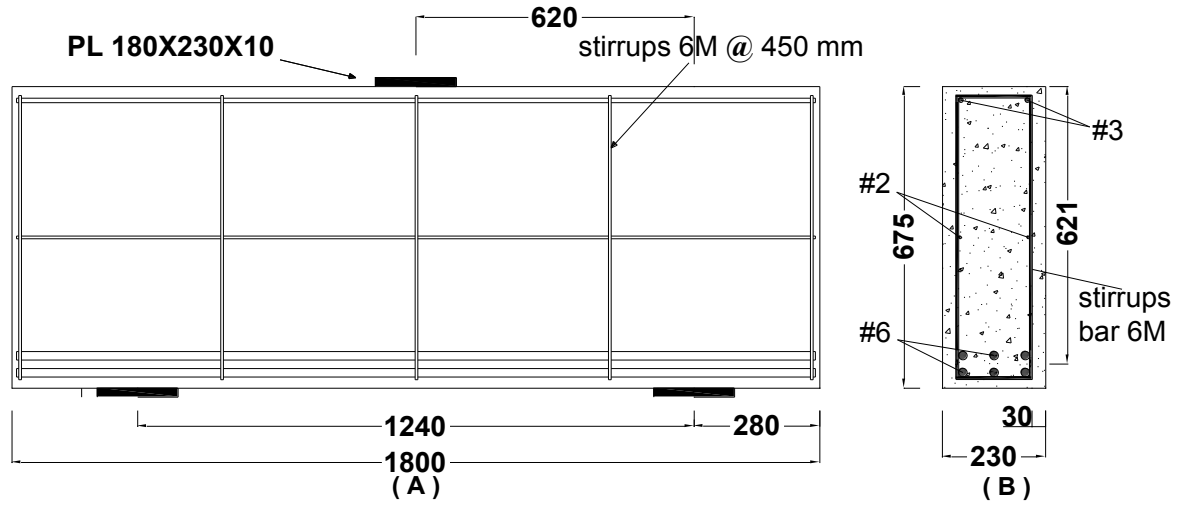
Beam A1/50: (A) elevation (B) cross section
